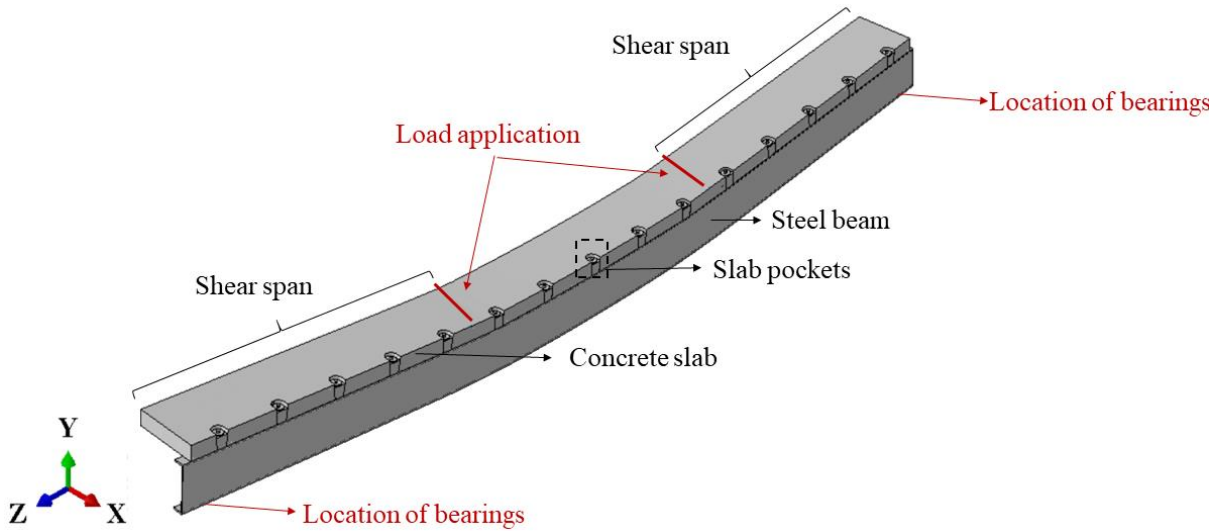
Deflection shape of the steel-concrete composite beam.
